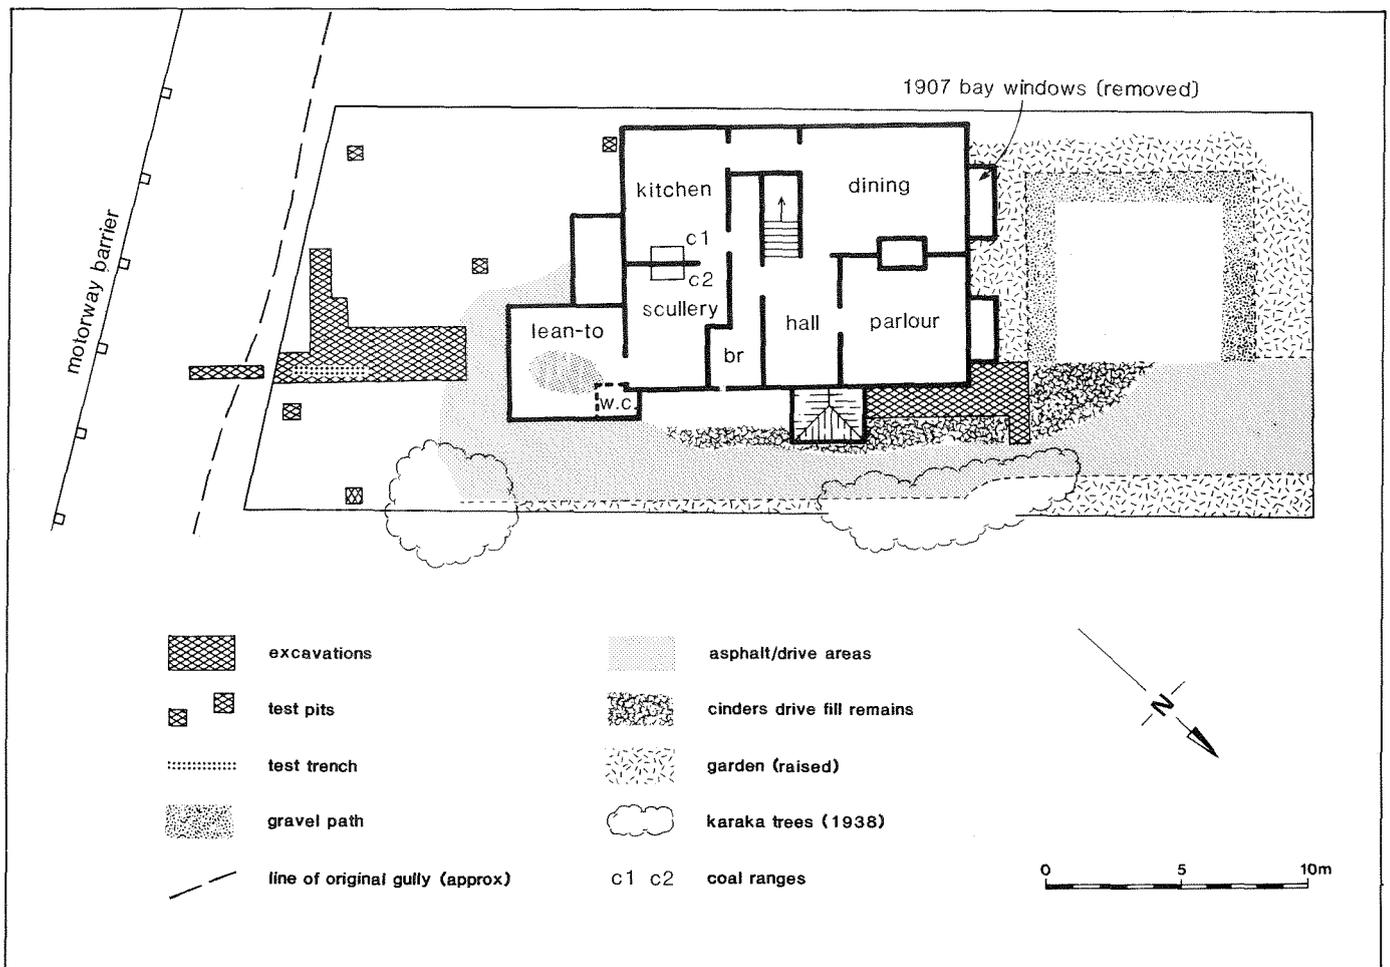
Plan of section at 25 Tinakori Road showing the interior layout of the ground floor in its 1907 form. The bay windows were added at this period and were removed in the course of the recent restoration. The floor of the lean-to was at ground level, hence the asphalted floor.
